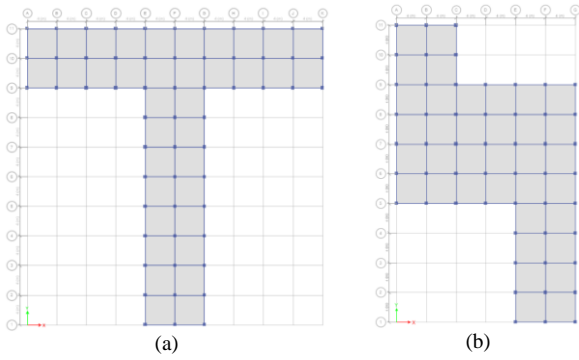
Plan of (a) T shape and (b) S shape building with conventional slab
